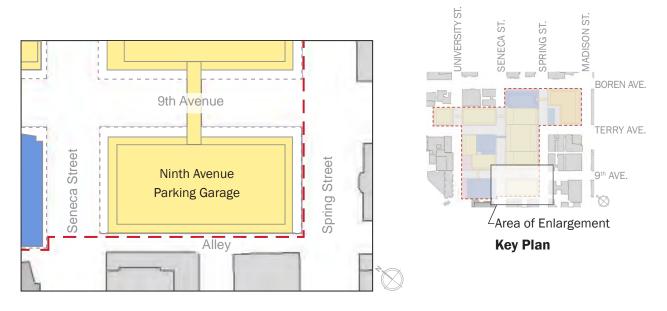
Proposed Building Setbacks – Ninth Avenue Garage Block
